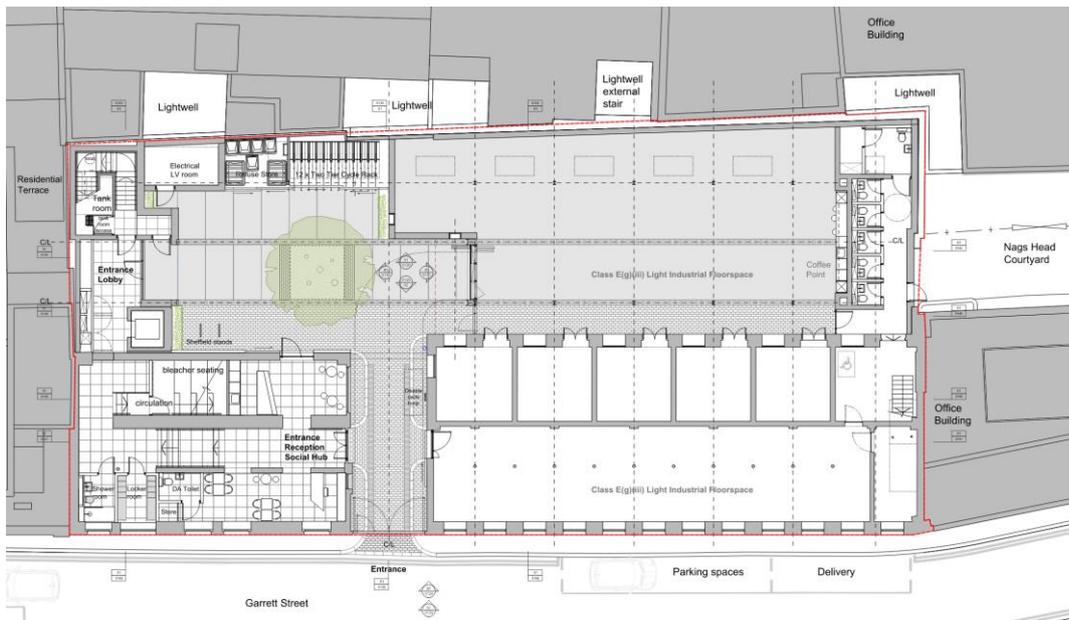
Proposed Ground Floor Plan (plan rotated so that south faces up)
